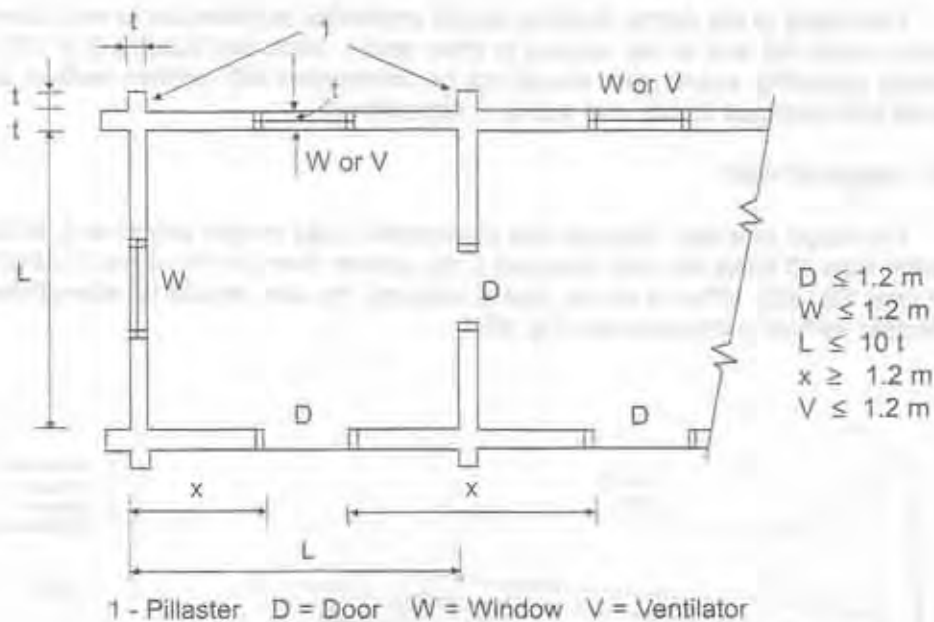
E Wall Dimensions, Pilaster at Wall Junctions
